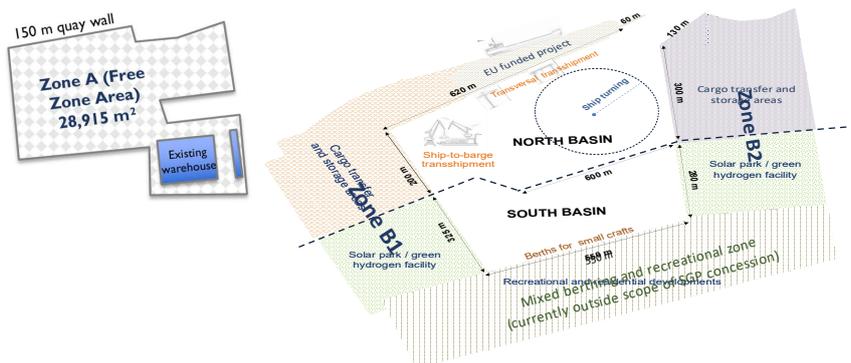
Proposed conceptual development plans and zones of the SGP project.
